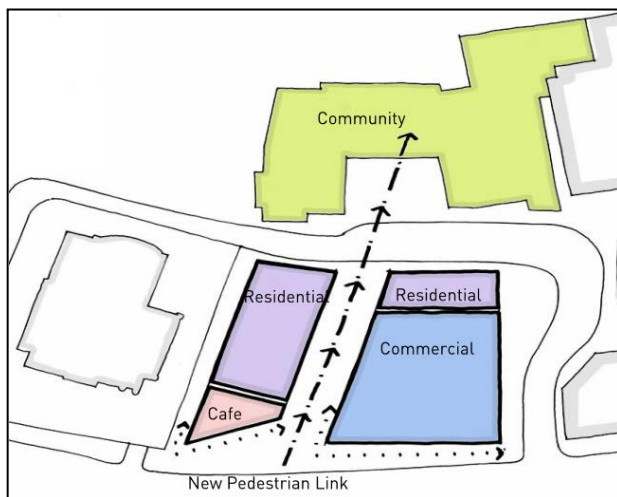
(left): The proposed pedestrian link from Highgate Road through to Greenwood Place. The plan shows the ground floor uses.
